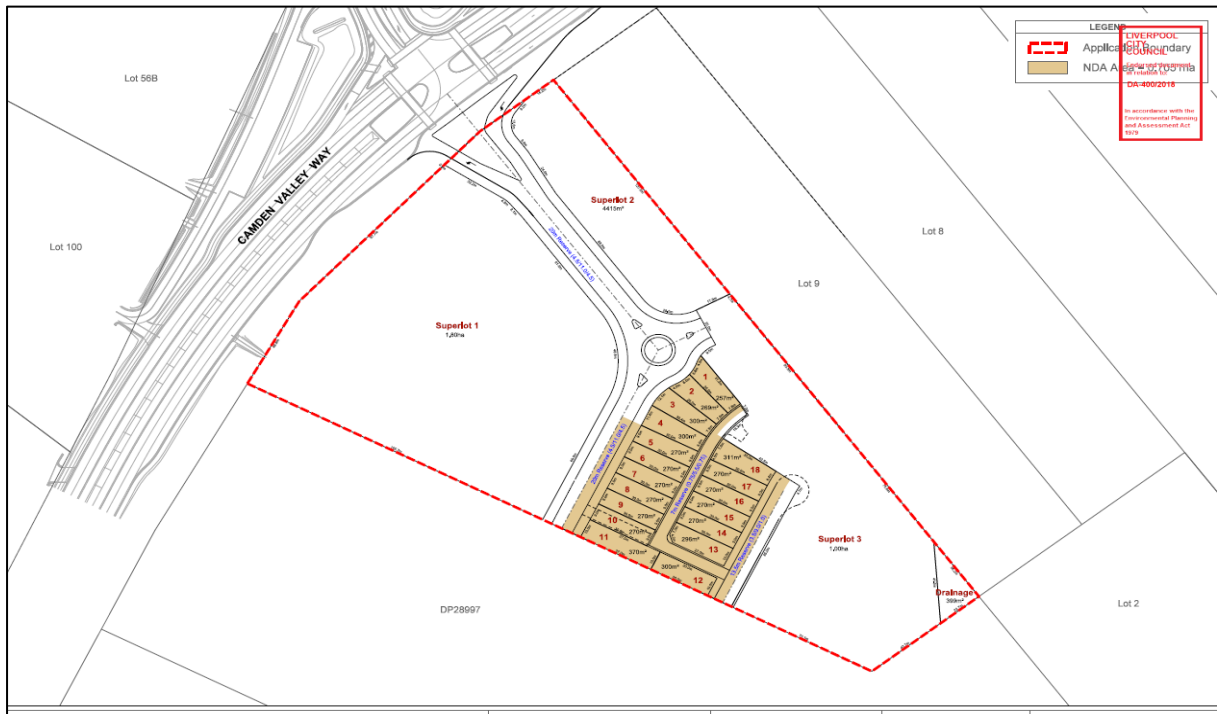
Extract of approved Subdivision Plan of DA-400/2018
